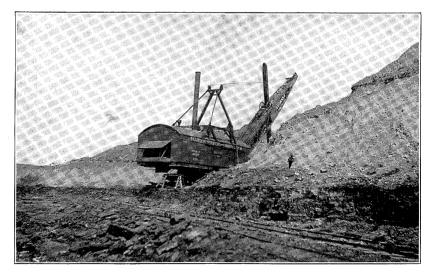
Fischer Fuel Co., stripping mine, Millstadt, showing method of removing overburden. (Photo by Fischer Fuel Co.)
